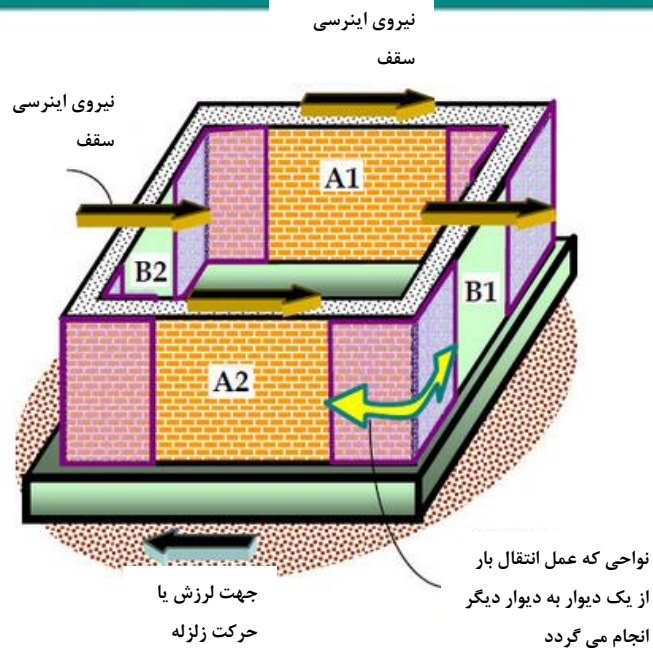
Regions of force transfer from weak walls to strong walls in a masonry building
